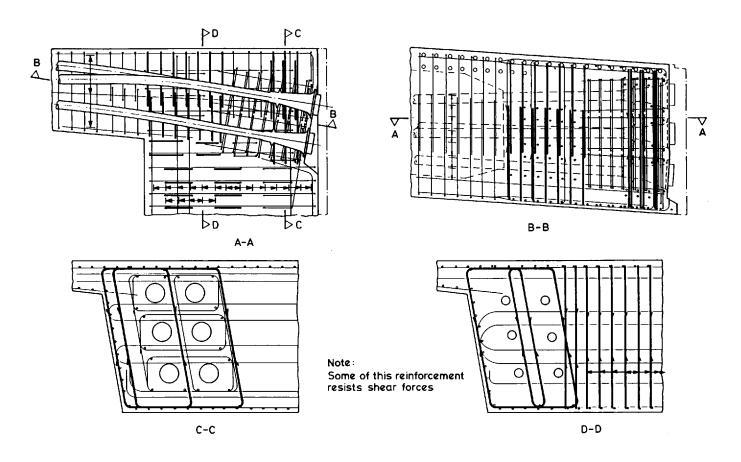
Post-tensioned end block - vertical equilibrium reinforcement
